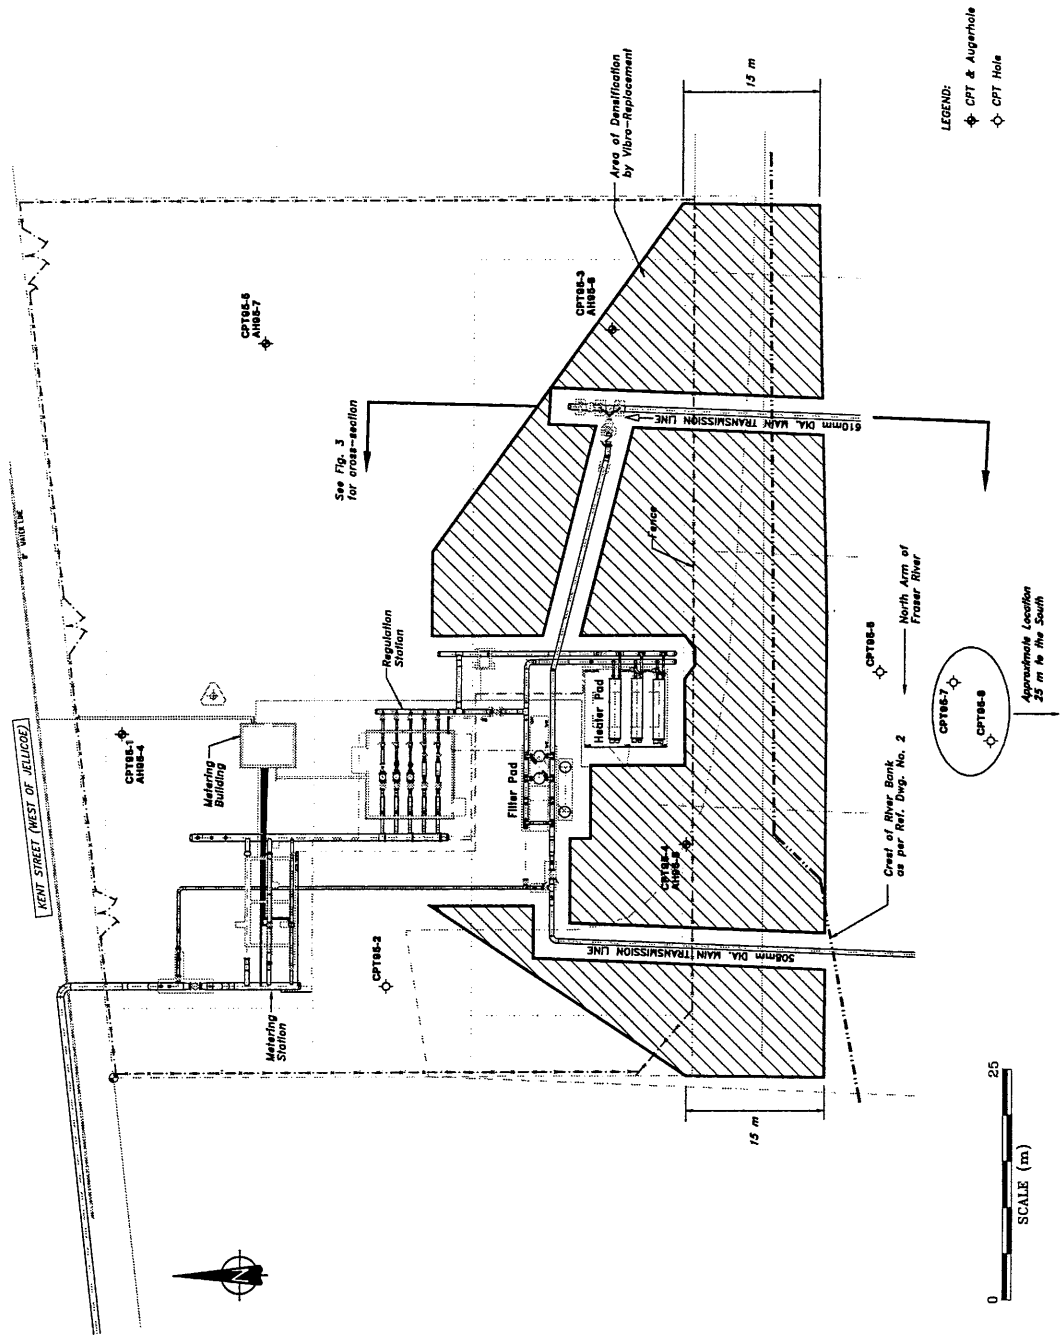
Site plan showing existing structures, pipeline configurations, and geotechnical testhole locations
